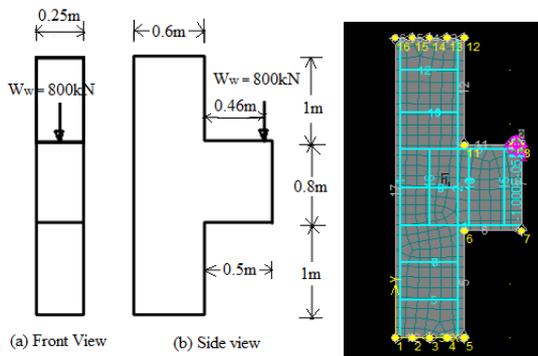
Dimensions details Fig.15. Mesh arrangement with reinforcement in corbel
